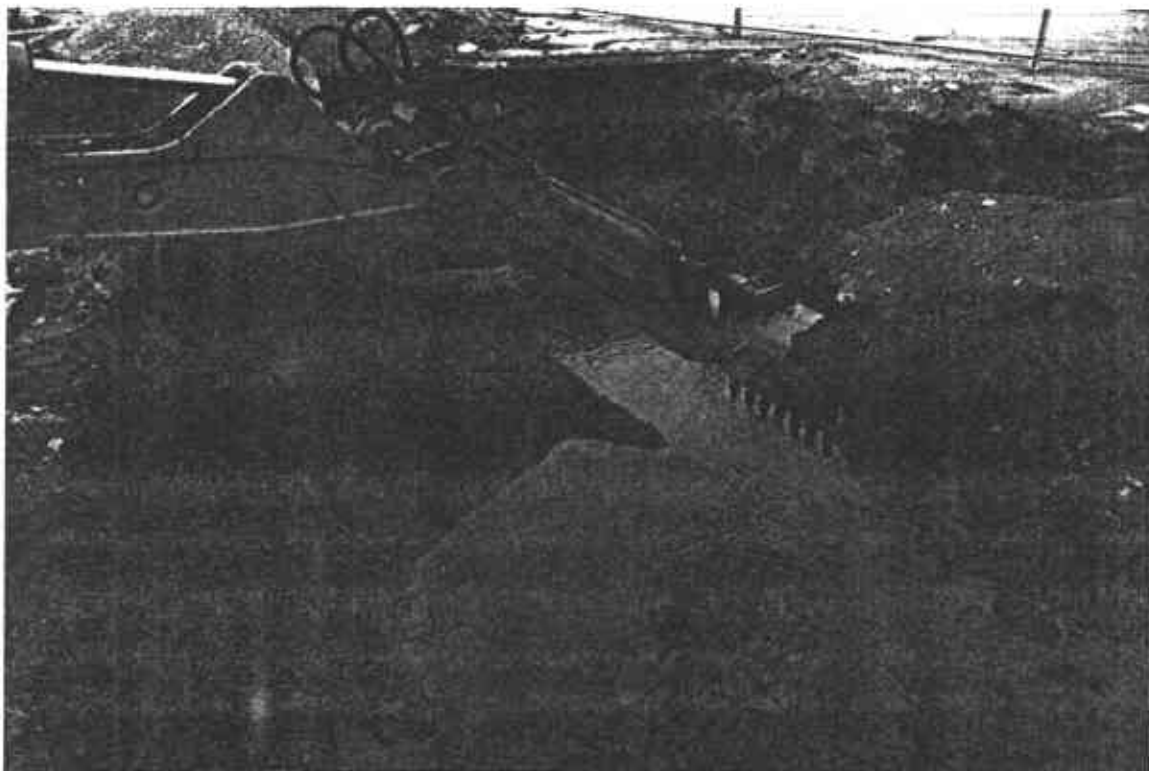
Removal of Tank No. 1 (Nearest to Building)
